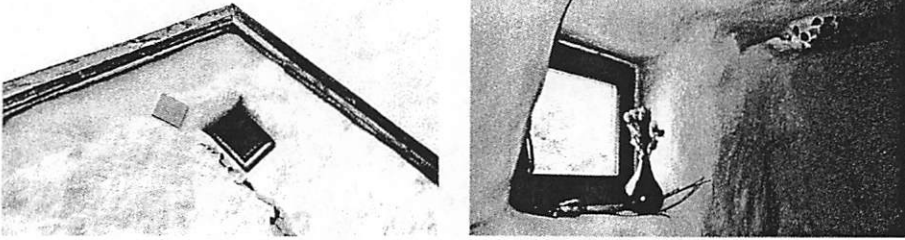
, 4. Undulated wall surface wall outside and inside of a straw bale house.
